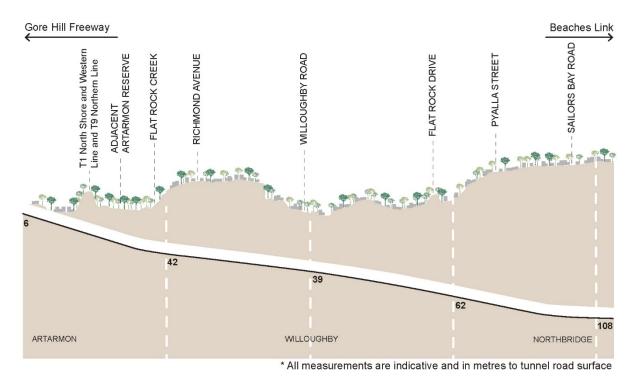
Indicative vertical alignment of the ramp tunnel connection to the Gore Hill Freeway
